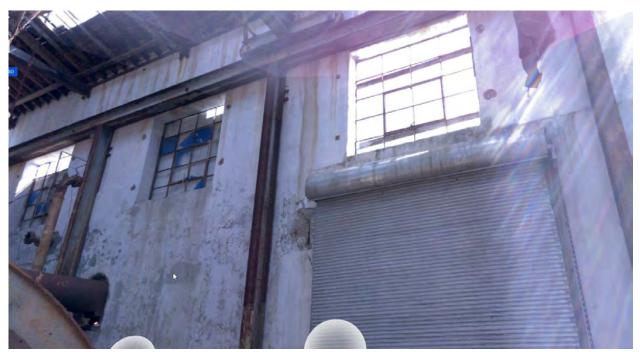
Building 4, Wall A interior elevation from 3D view.
